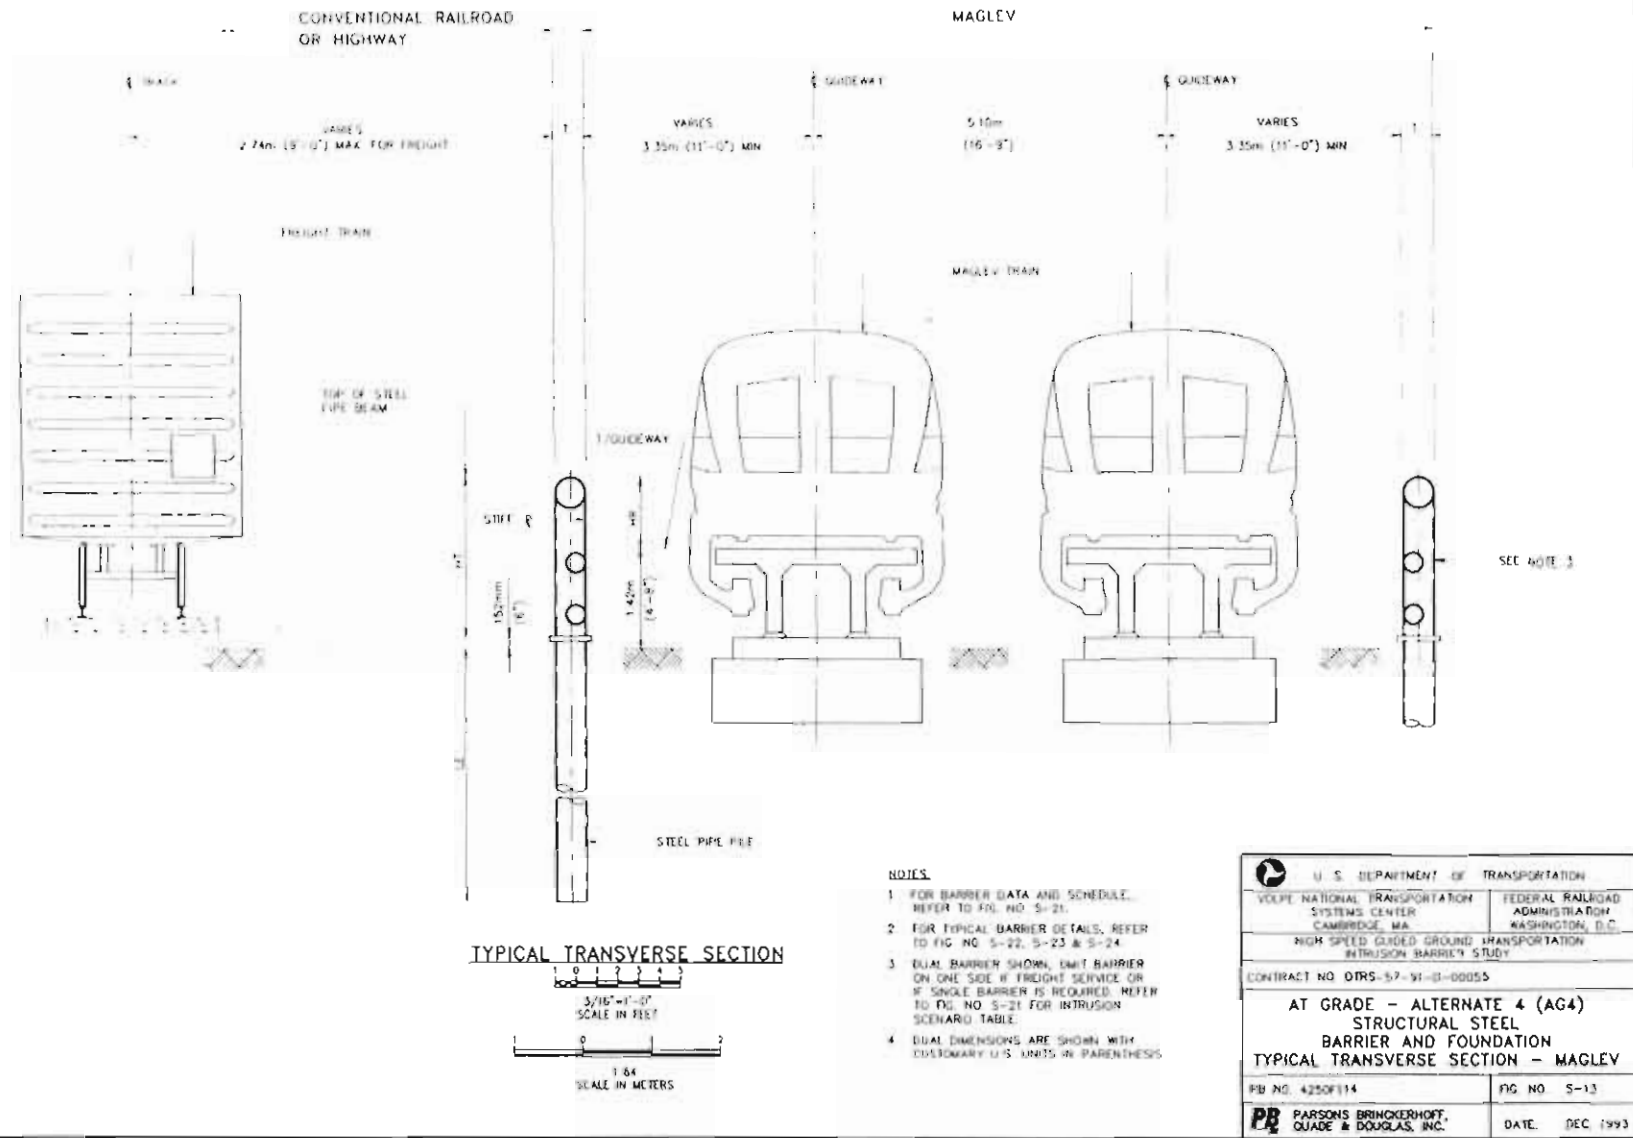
AT GRADE ALTERNATE 4: STRUCTURAL STEEL POST, RAILING AND FOUNDATION - TRANSVERSE SECTION/MAGLEV
